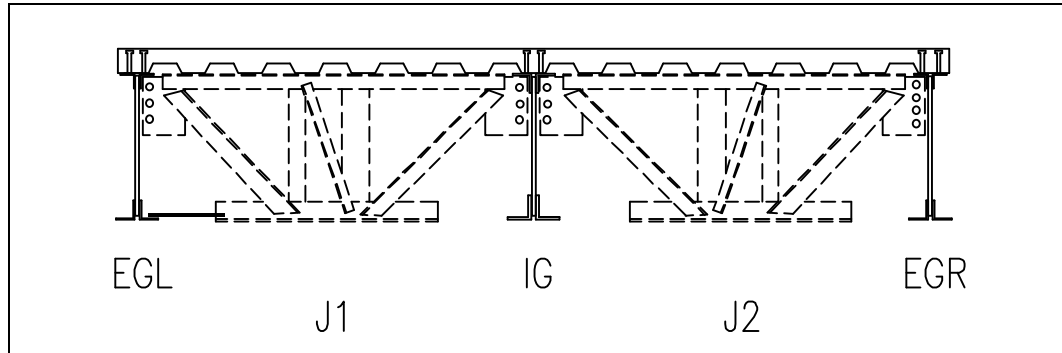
Flush Framed Girder Specimen Cross-Section
